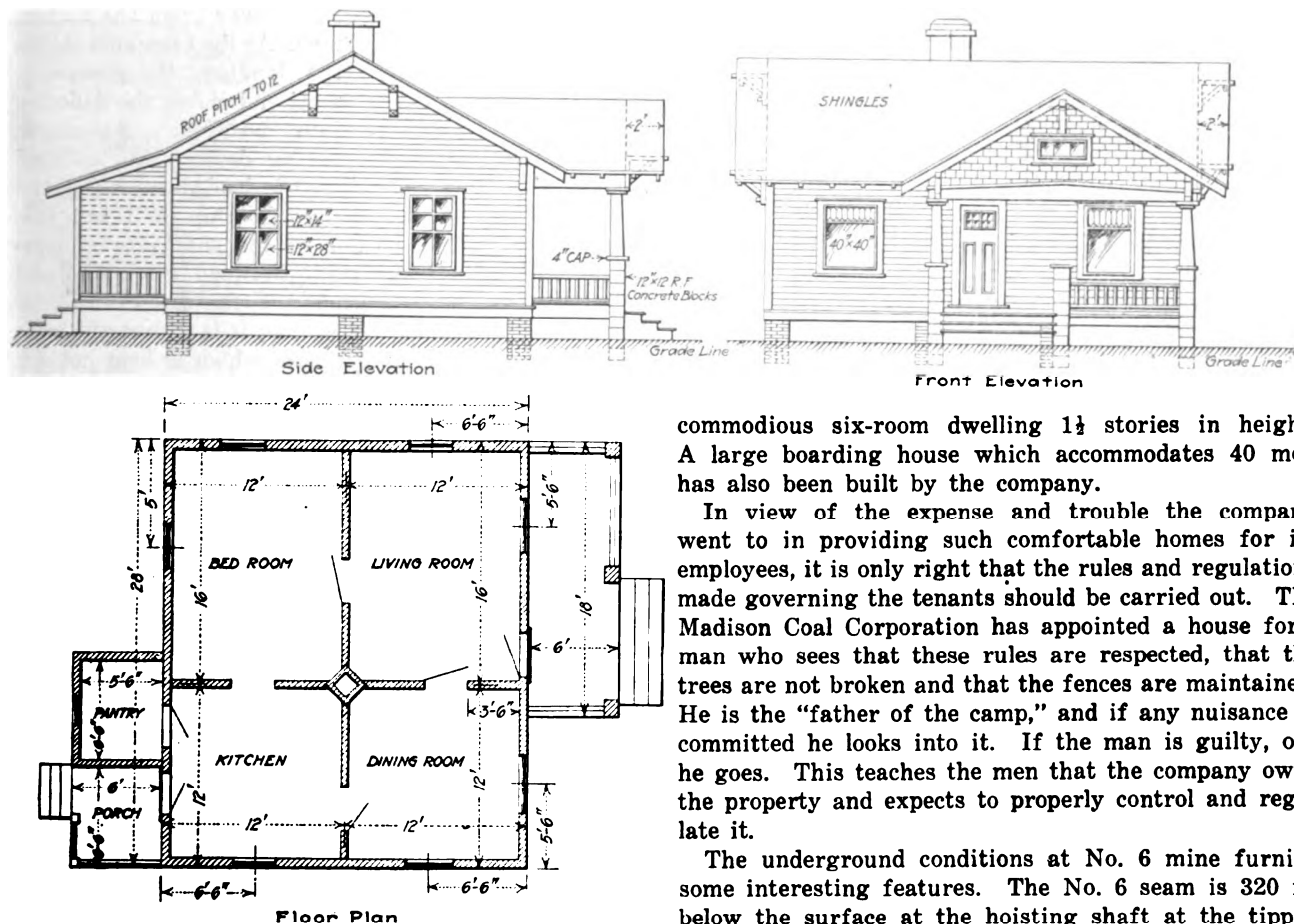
ELEVATIONS AND PLAN OF ONE TYPE OF EMPLOYEES' HOUSES OF MADISON COAL CORPORATION'S NO. 6 PLANT
